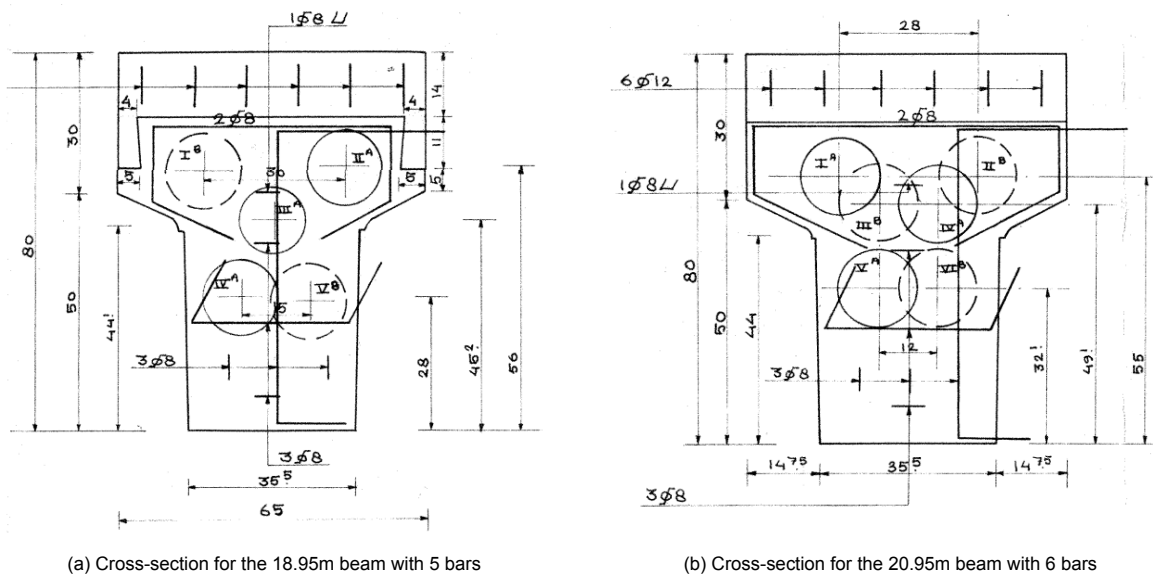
Cross sections of the T-beams with multiple prestressing bars. (a) shows the shorter T-beam used in the outer span, while (b) shows the longer beams used in the inner span. The cross-sectional view is from the north side [49].
